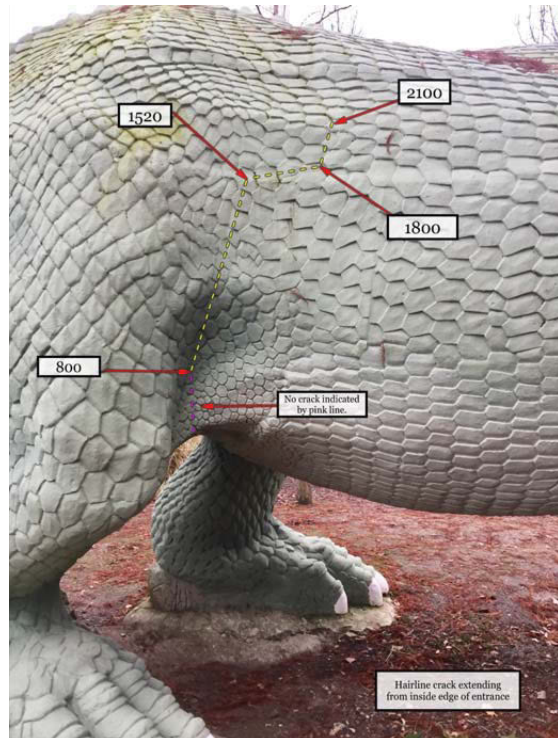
Crack 16a – Photographed 15.12.16<sup>82</sup>
